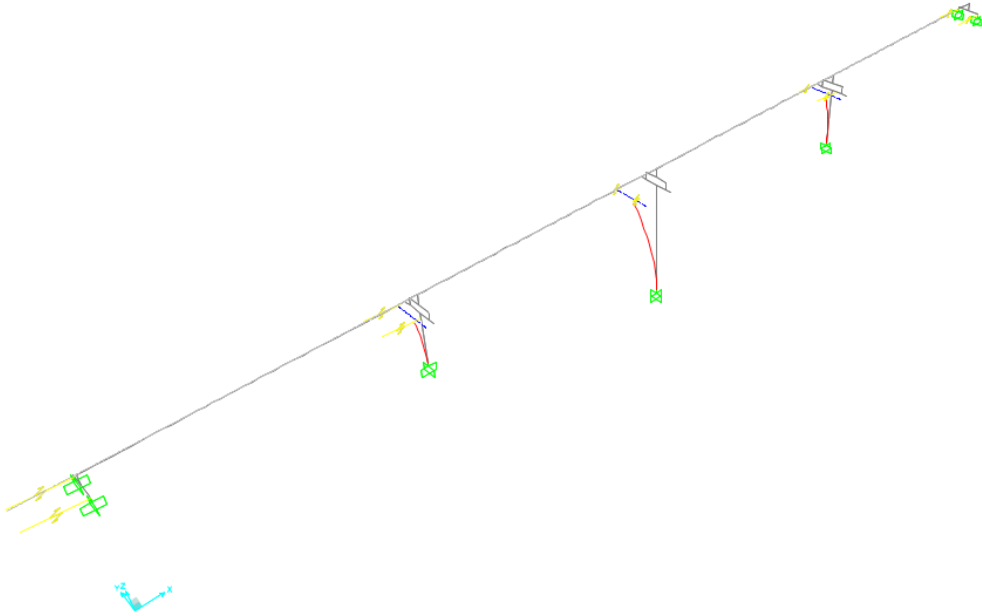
Deformed shape of the first mode $2.915Hz$
